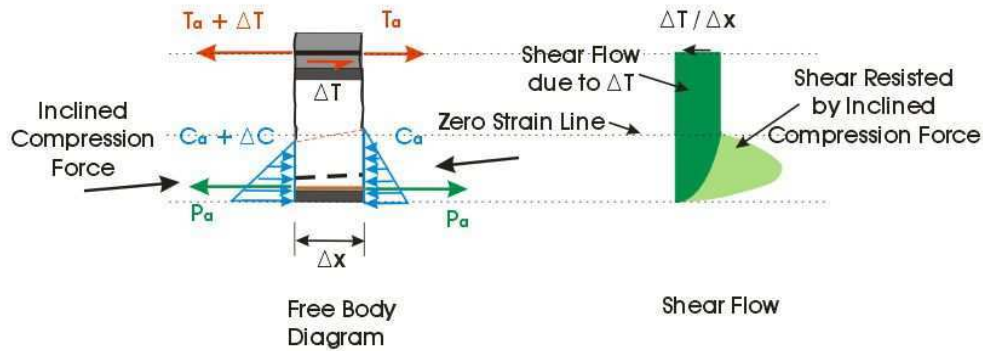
Shear flow between cracks in a section of hollow-core floor
